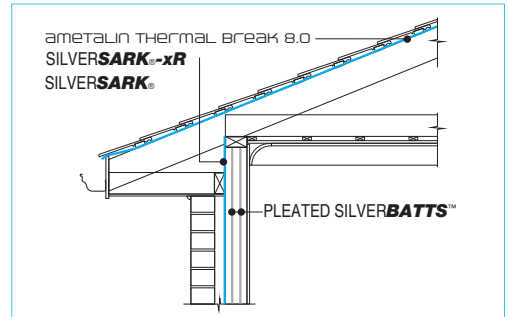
Typical residential 22° pitched tiled roof, flat ceiling, typical brick veneer, one layer of Ametalin product and two layers of PLEATED SILVERBATTSTM.
